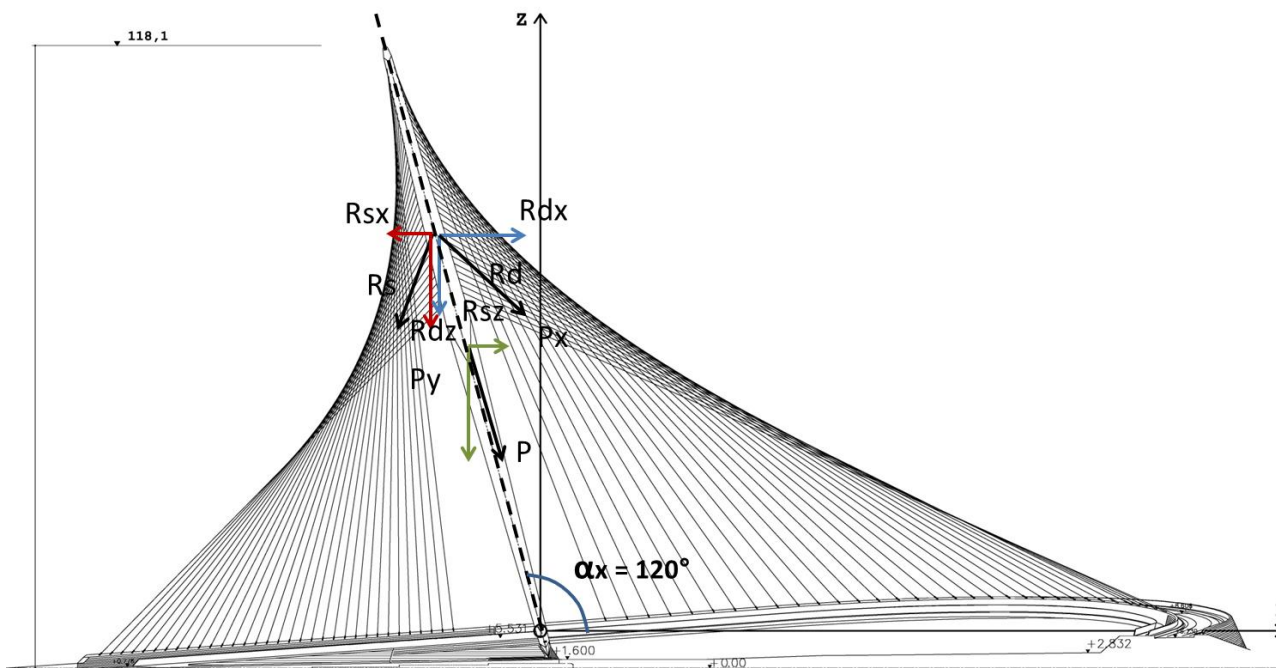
Bridge of Strings (light rail train) Jerusalem (2002-2008) bridge deck detail
